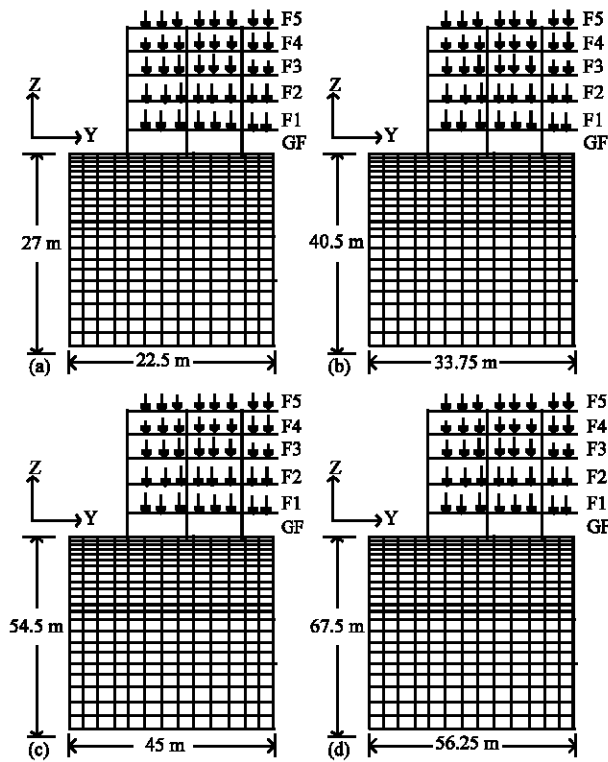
Element discretization of frame-raft-soil; (a) 3 m, column spacing, (b) 4.5 column spacing, (c) 6 m column spacing and (d) 7.5 column spacing
